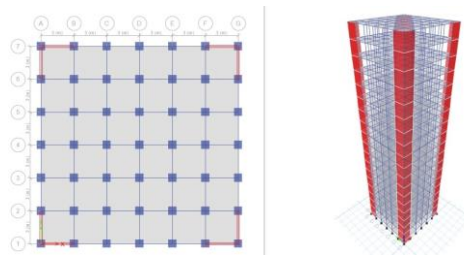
SHEAR WALL AT CORNER FOR REGULAR BUILDING
